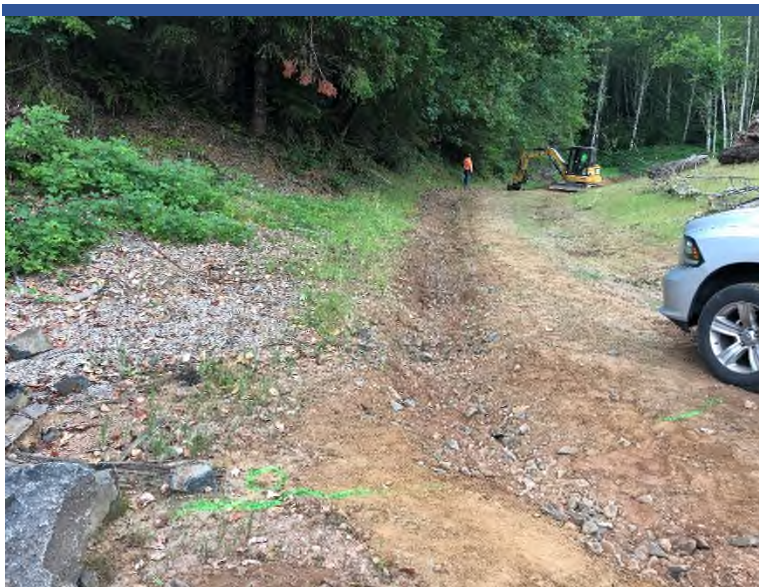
ERRS conducting work on Adit Creek reroute enhancement to improve flow and drainage around repository.
